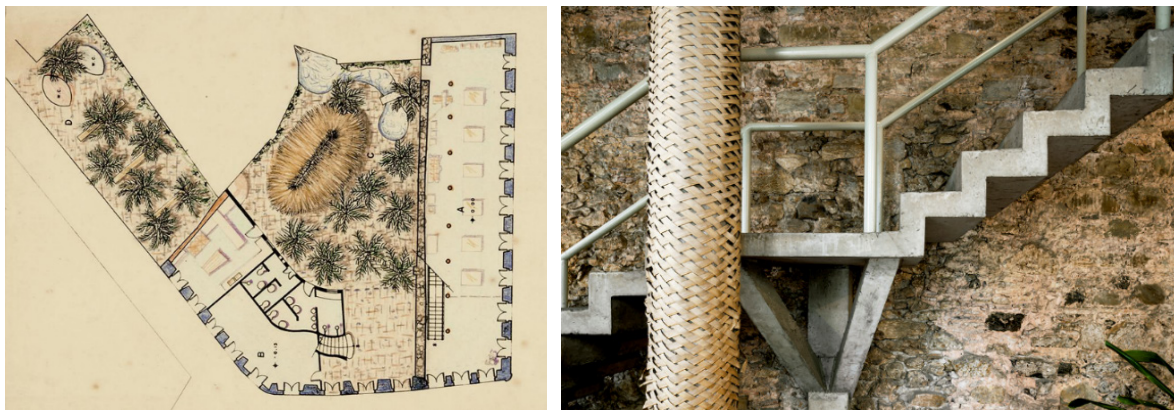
Casa do Benin (1987) plan and reinforced concrete staircase.
